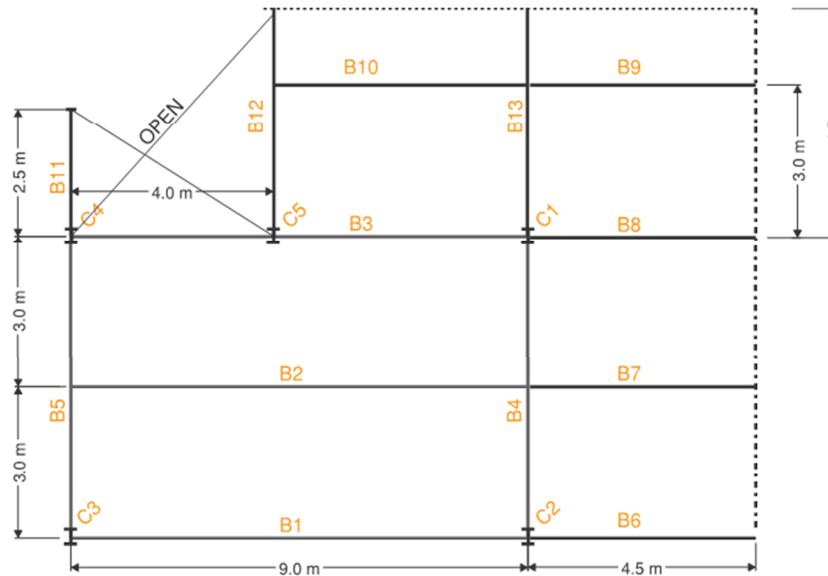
Cardington Corner Test floor geometry; adapted from Lennon (1999)
